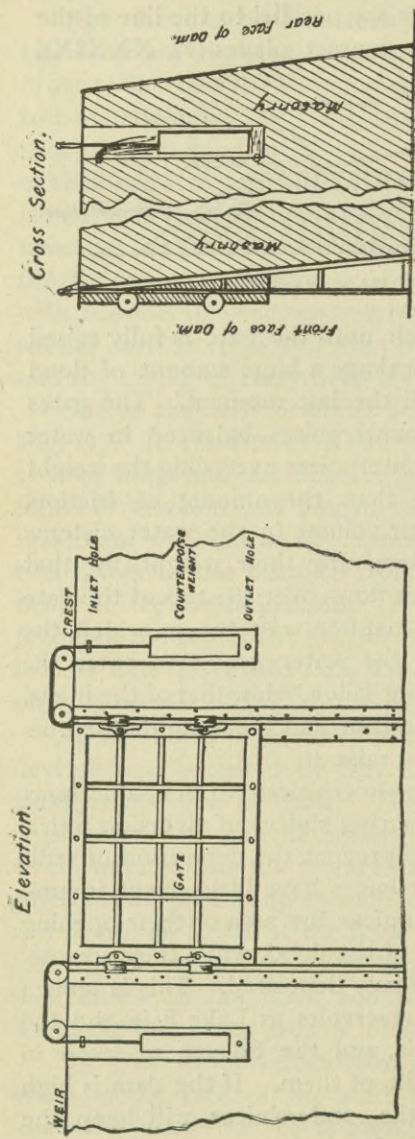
PLATE XXXIX.—PLAN, ELEVATION, AND CROSS-SECTION OF REINOLD'S AUTOMATIC WASTE GATE, INDIA.
